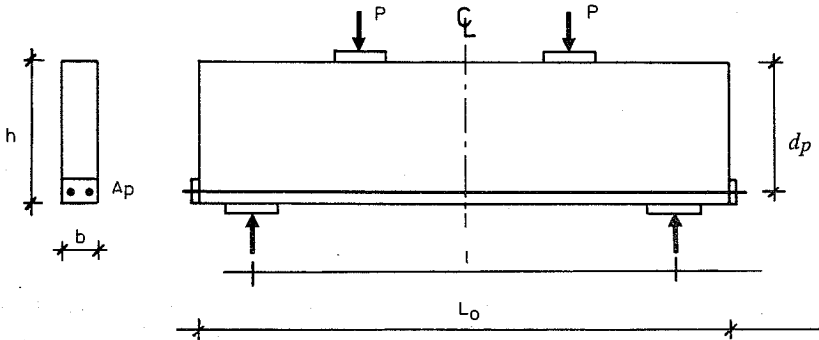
Rectangular unbonded prestressed concrete beam subjected to concentrated loads.
